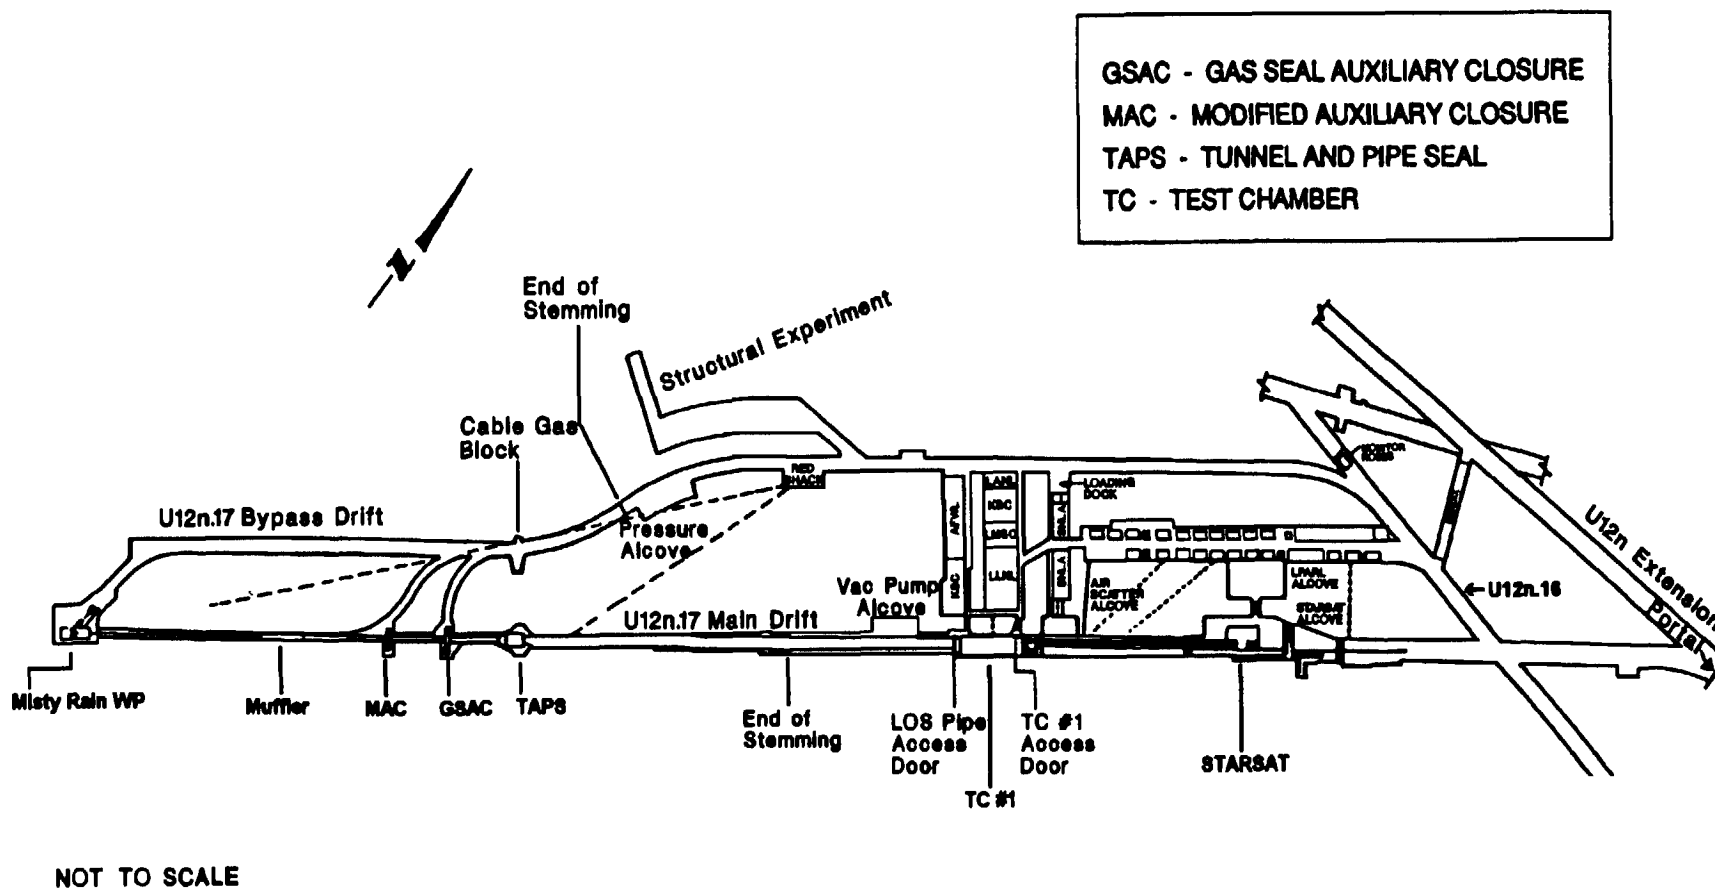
MISTY RAIN event - tunnel and pipe layout.
